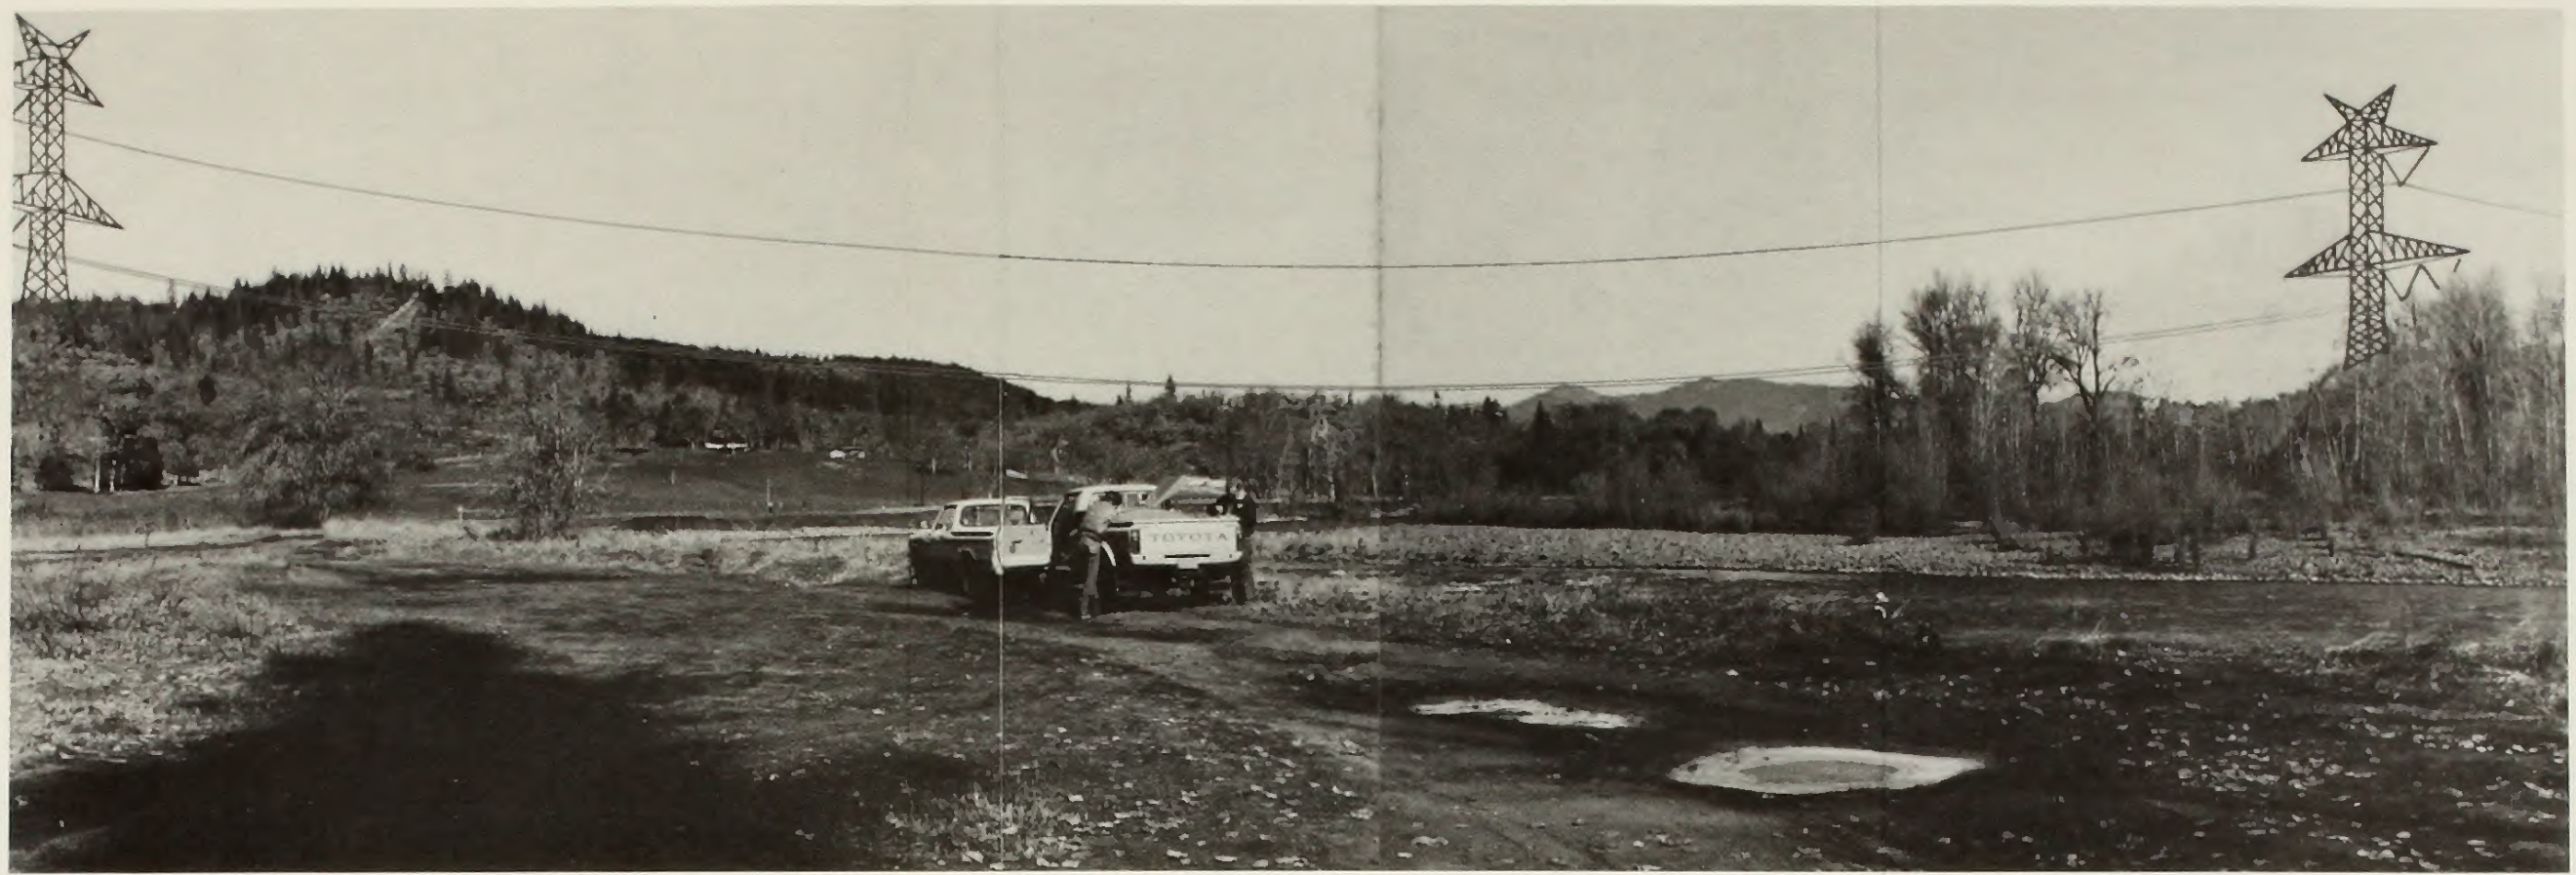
SIMULATED VIEW OF ALTERNATIVE THREE AT ROGUE RIVER CROSSING (DOUBLE CIRCUIT STEEL LATTICE STRUCTURES). IN ACCORDANCE WITH A PLANTING PLAN TO BE NEGOTIATED WITH THE JACKSON PARKS AND RECREATION DEPARTMENT, TREES AND SHRUBS WOULD BE PLANTED TO HELP SCREEN THE LINE FROM RECREATION ACTIVITY AREAS.
